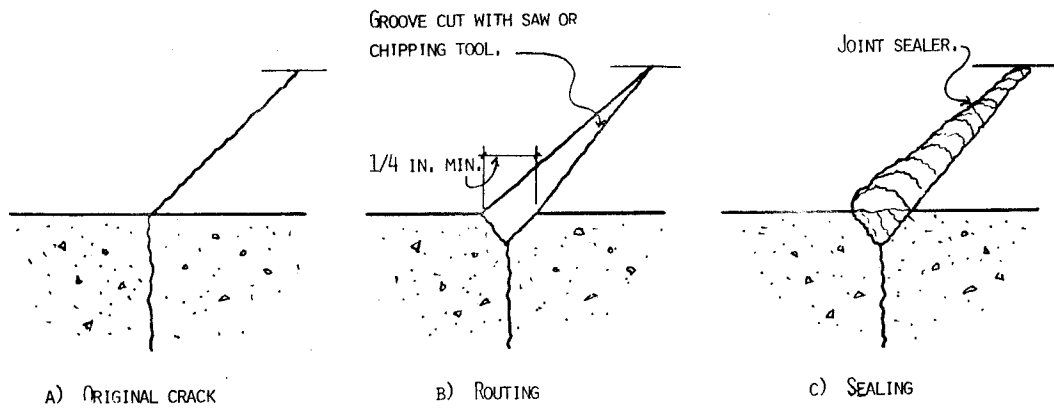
Repair of crack by routing and sealing (ACI Committee 224, 1984).
